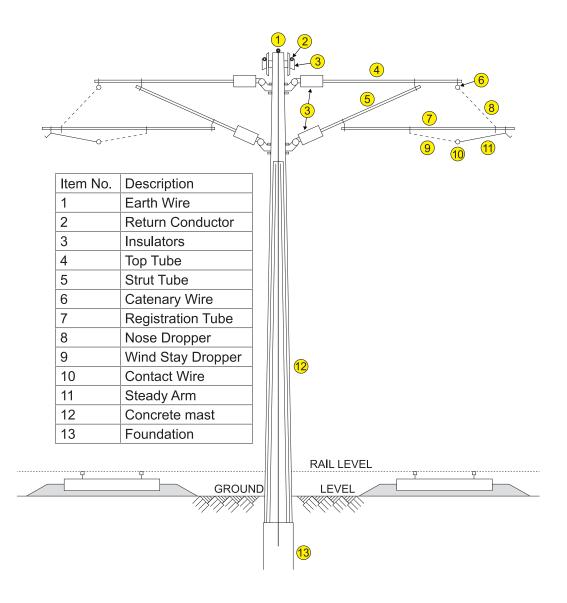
Typical Back to Back Cantilever Arrangement
